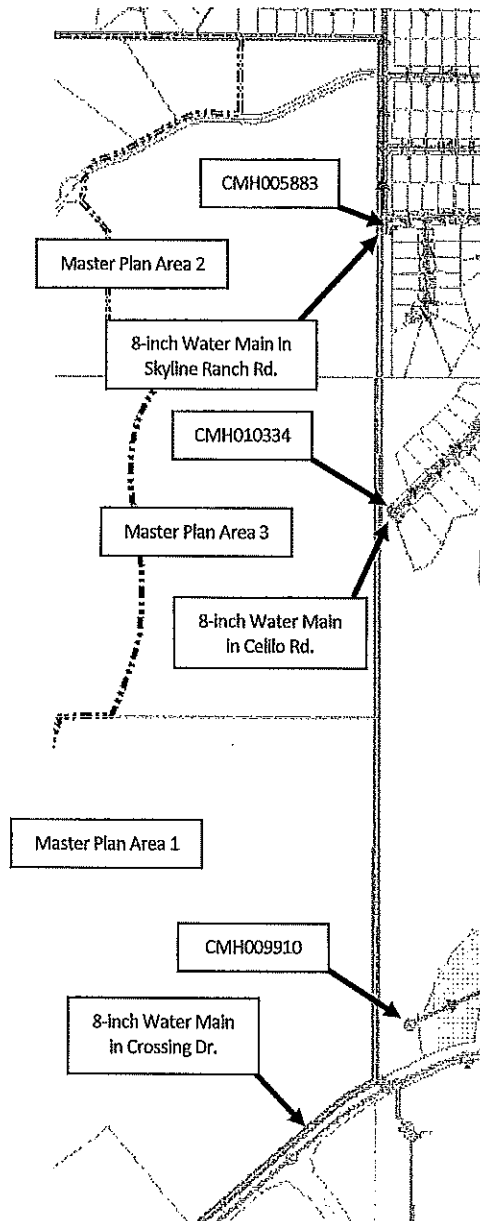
Master Plan Areas 1,2, and 3 Potential Connection Points
